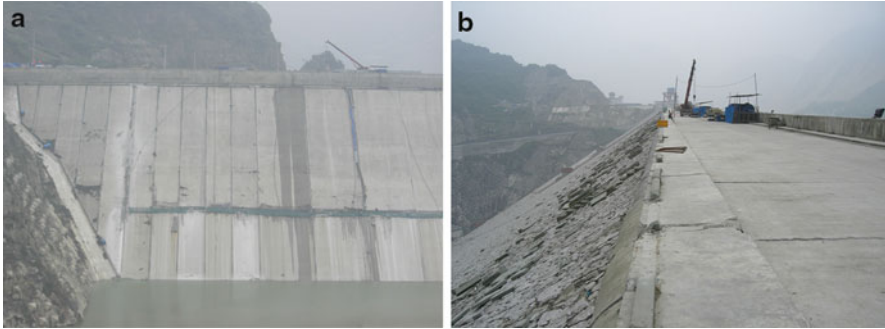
Damage to Zipingpu dam (2008 Wenchuan earthquake, China, concrete facing dam, height: 156 m). (a) Damage to concrete facing. (b) Subsidence of the dam crest
